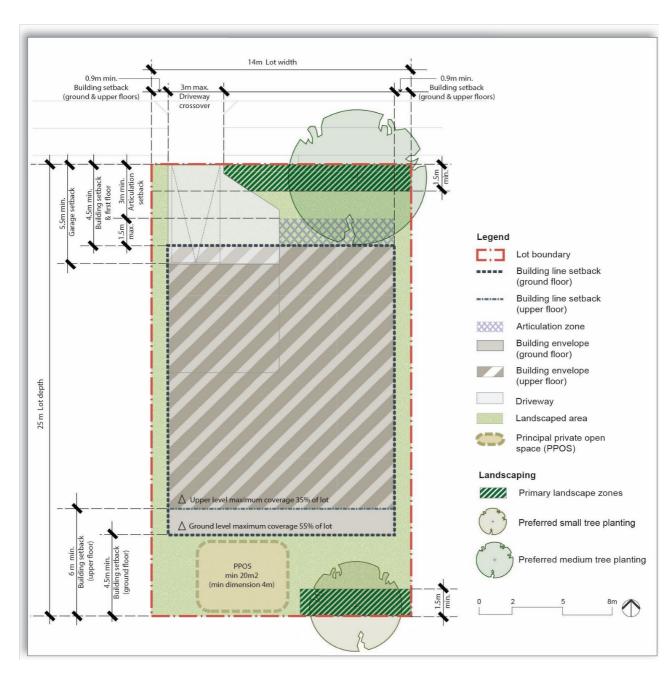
Typical lot layout on lots ≥12.5m but ≤15m
